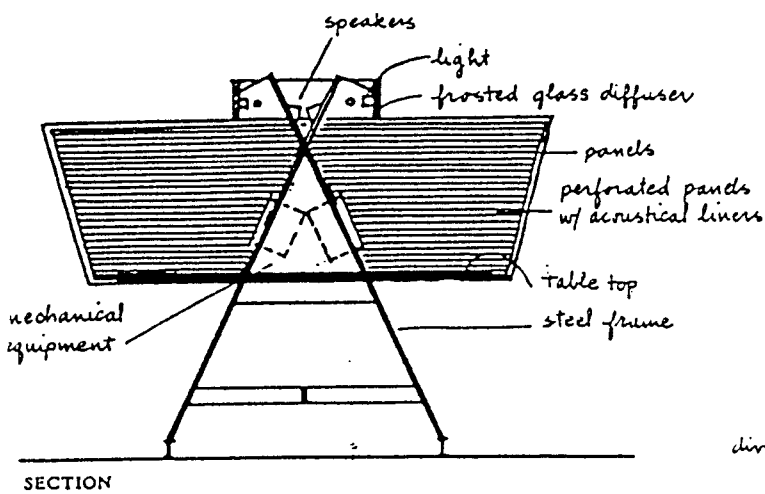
Carrels with mechanical equipment built in, based on a steel or aluminum "X" frame. Frame folds up like a card table, can be used for other purposes as well.
